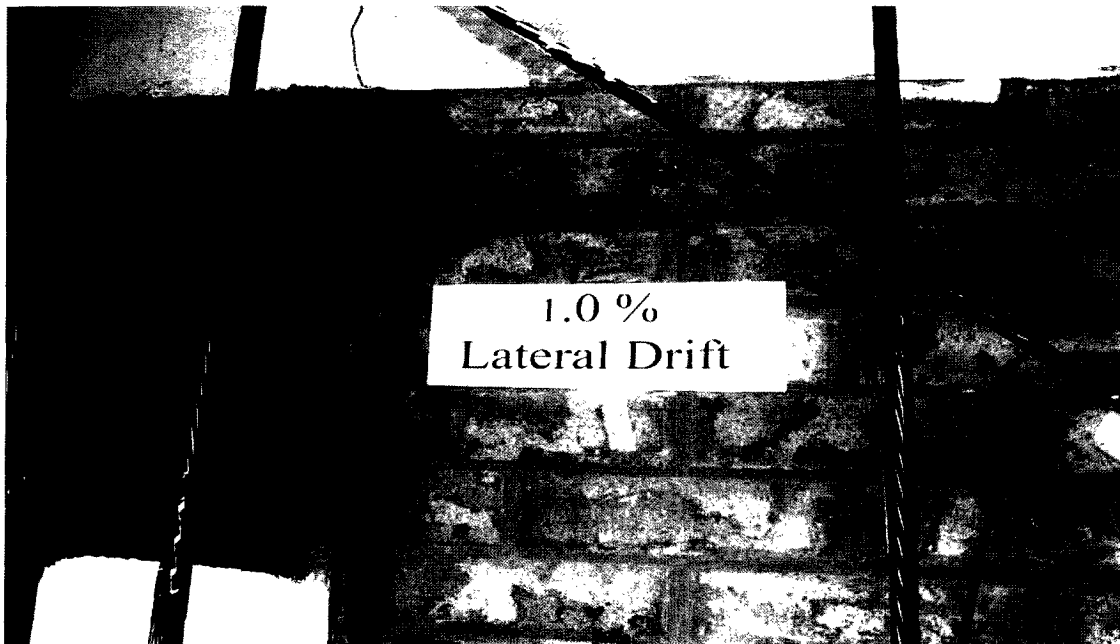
Widening of gap between wall and column at 1.0 % lateral drift (BR-3)
